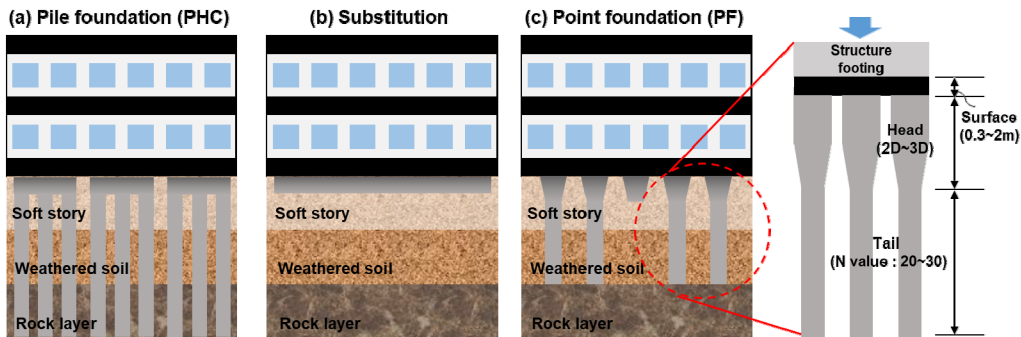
Cross-sectional view of point foundation method (Kim 등, 2016).
